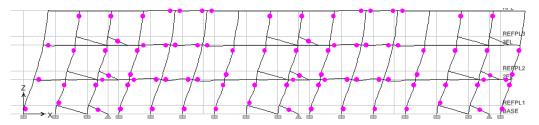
Formation of plastic hinges in the structure retrofitted with column jacketing
